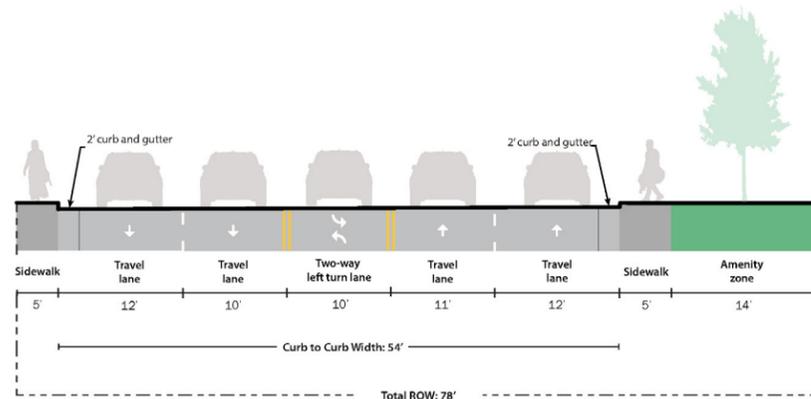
Section J (72nd Avenue West of Bryant Street – Looking East)
